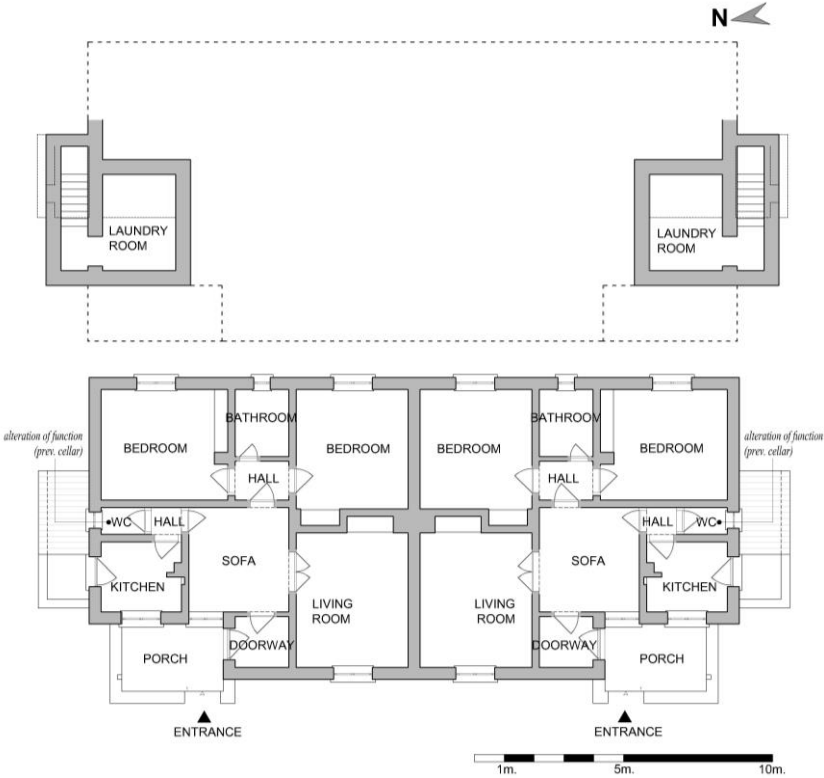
Basement and ground floor plans of Employee Dwelling Type 6
